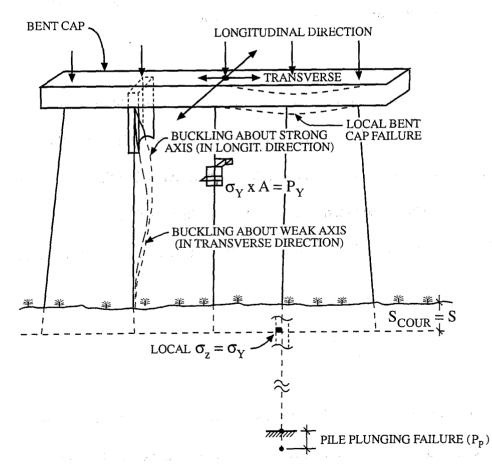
Possible Failure Modes for Bridge Pile Bents
